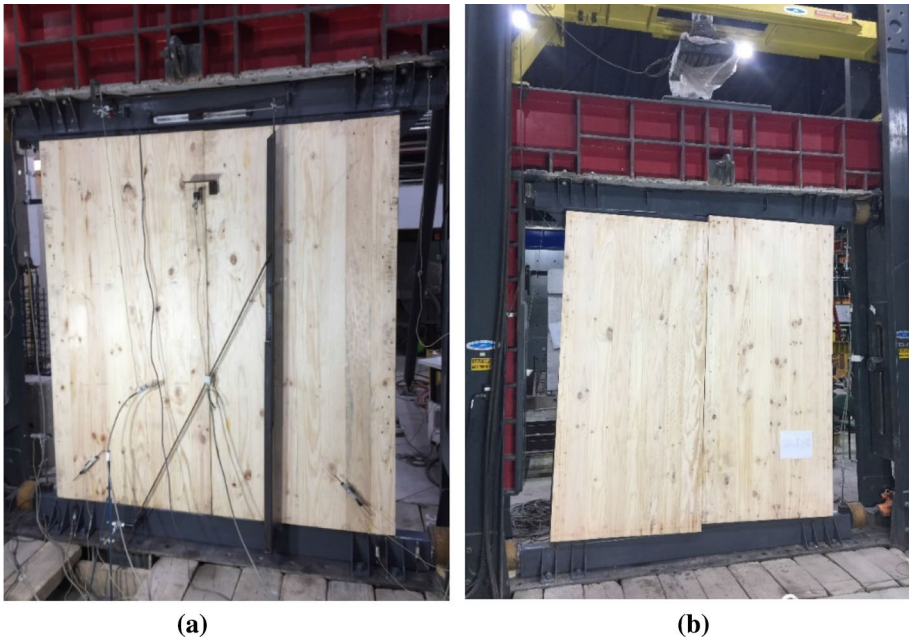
Illustration of an FPSW wall: a instrumentation measures behind the wall; b the specimen in a final loop from a reversed cyclic test on loading frame
